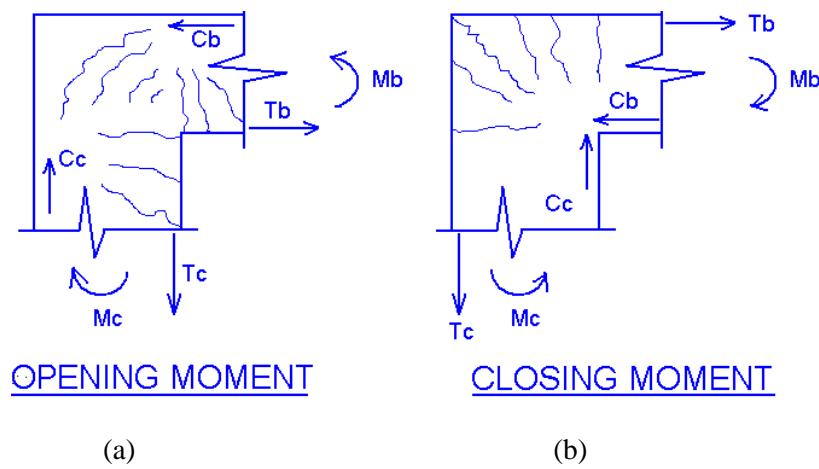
Knee Joint Failure Modes
